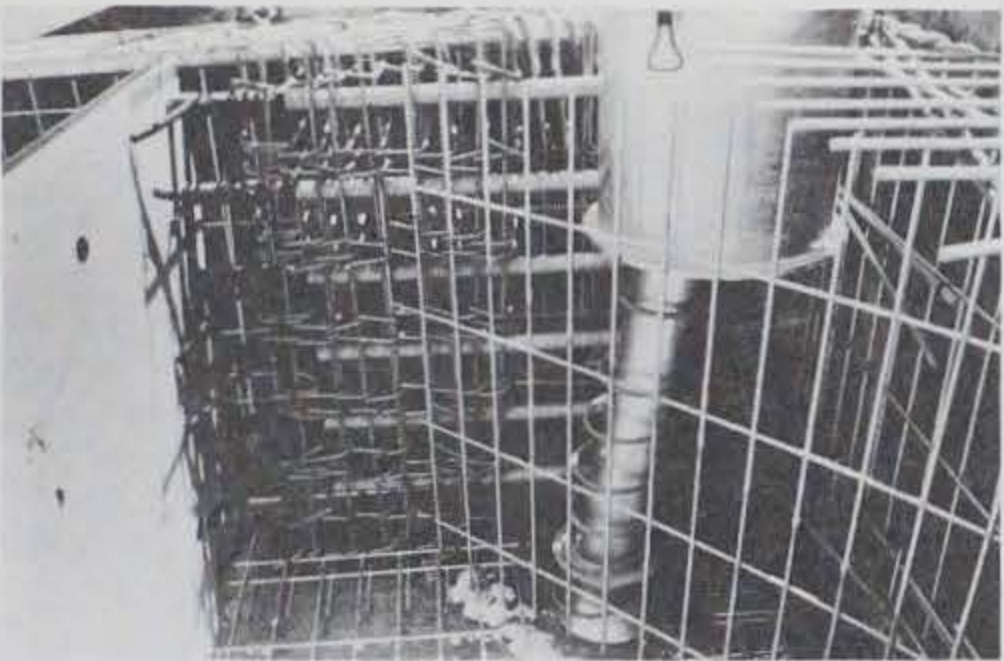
Reinforcing steel being installed around hawse pipes and chain locker.
